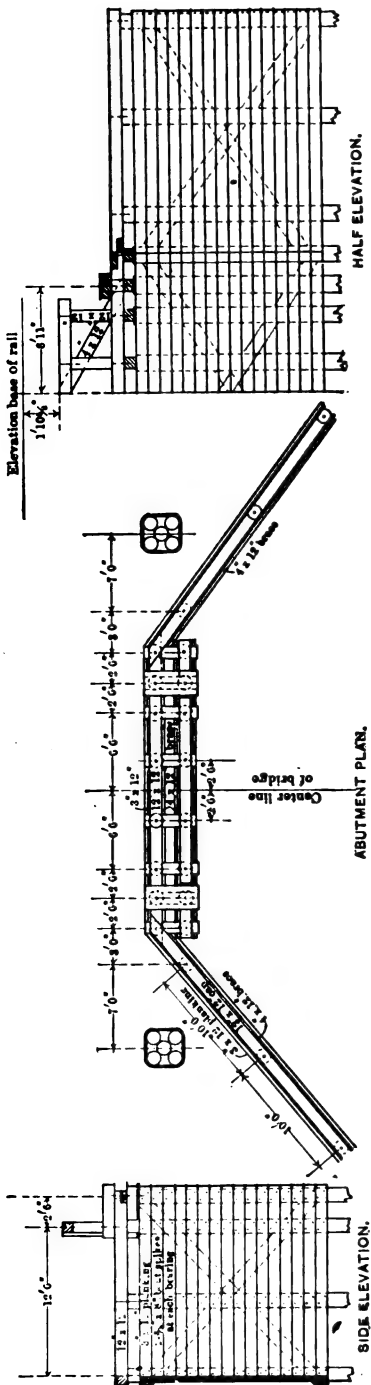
PILE PIER, PUGET SOUND ELECTRIC RAILWAY.
